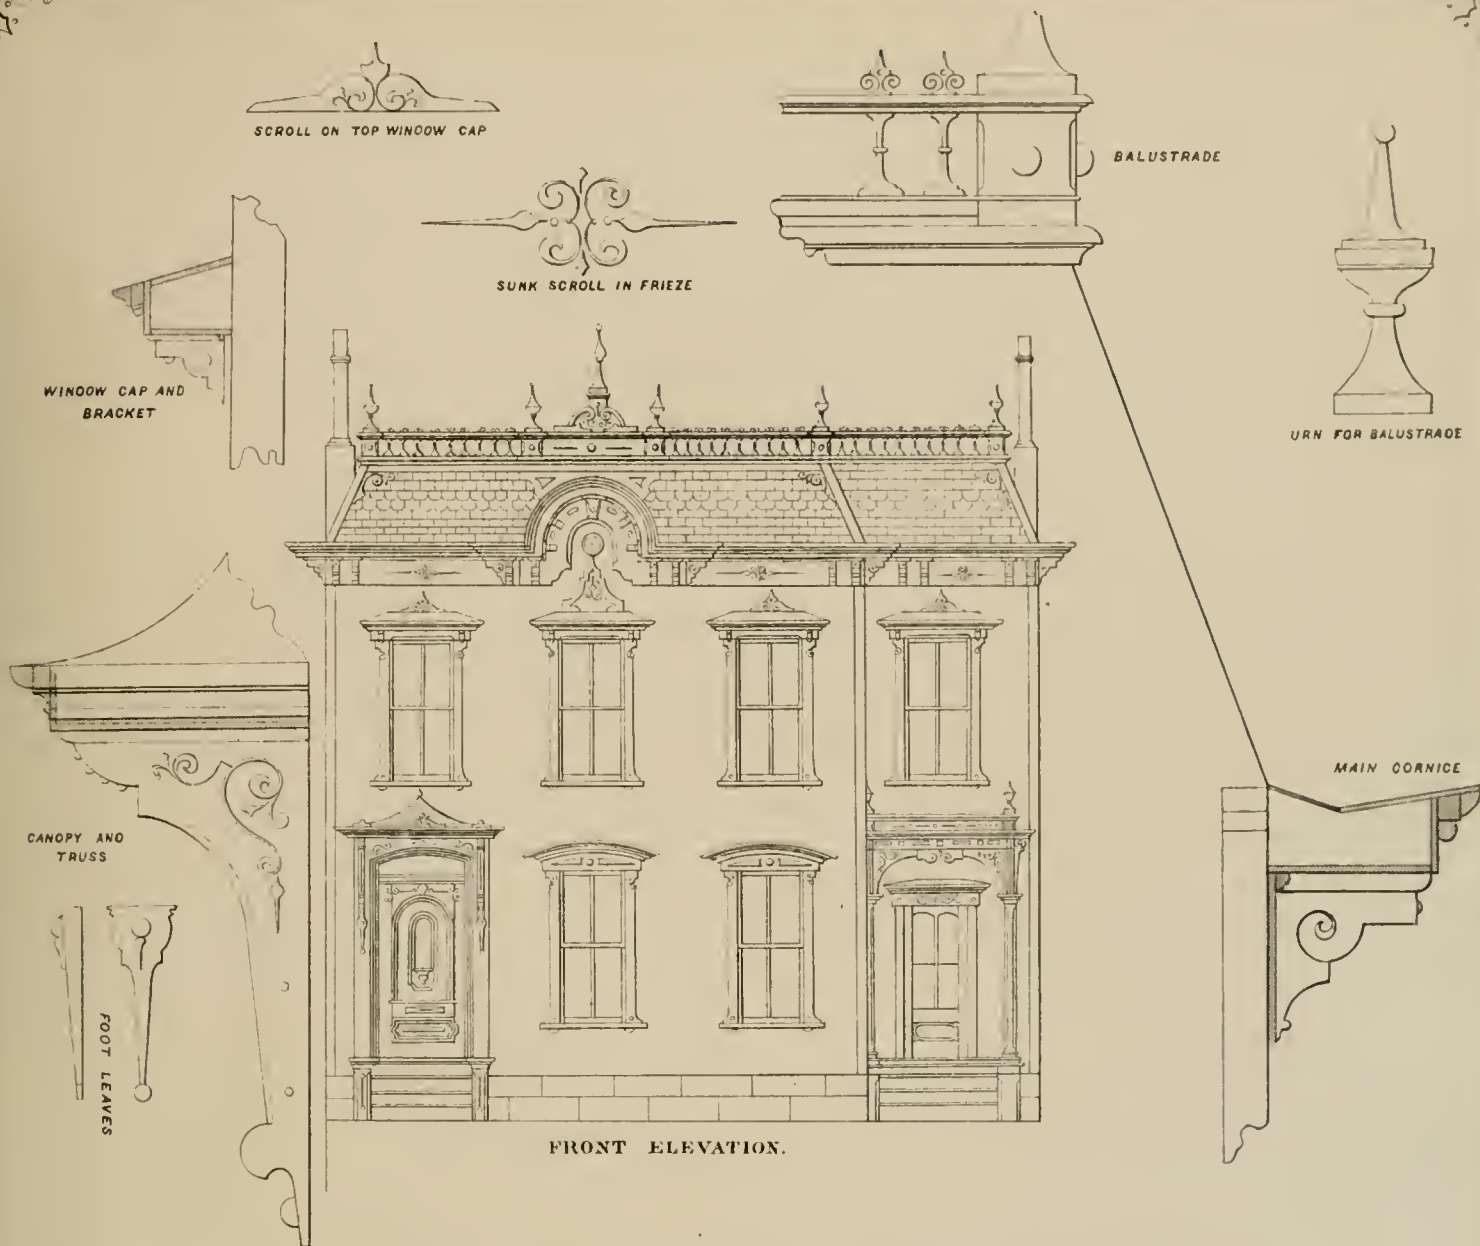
Contains the front elevation, first floor plan, and details of Cornice, Balustrade, Canopy, Window-caps, &c.
